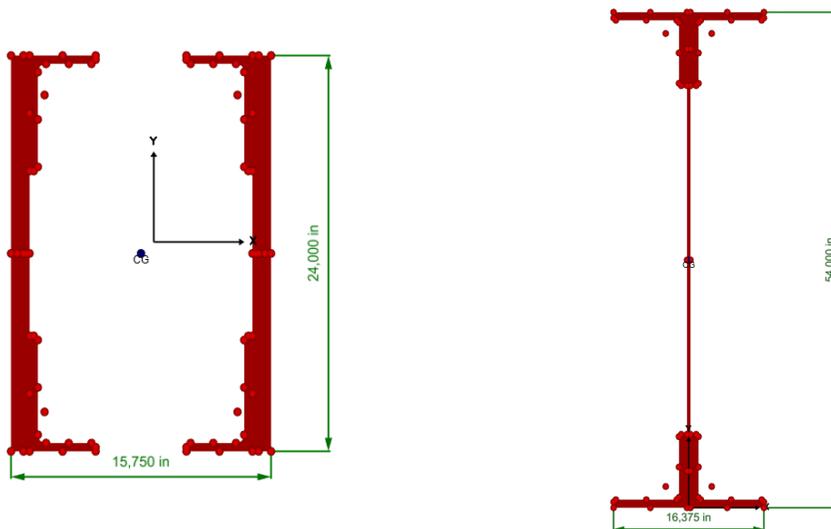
Cross sections of the truss bottom-chord (left) and plate girder (right)
